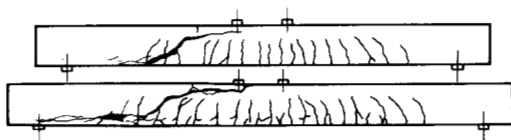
Figure I: Stuttgart shear tests⁽²⁾. Failures in beams 7/1 and 8/1.
